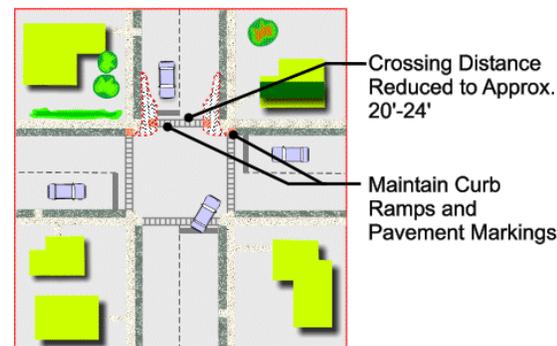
An example of bulb-out placement to reduce curb radii and shorten travel distance for pedestrians crossing at an intersection.
